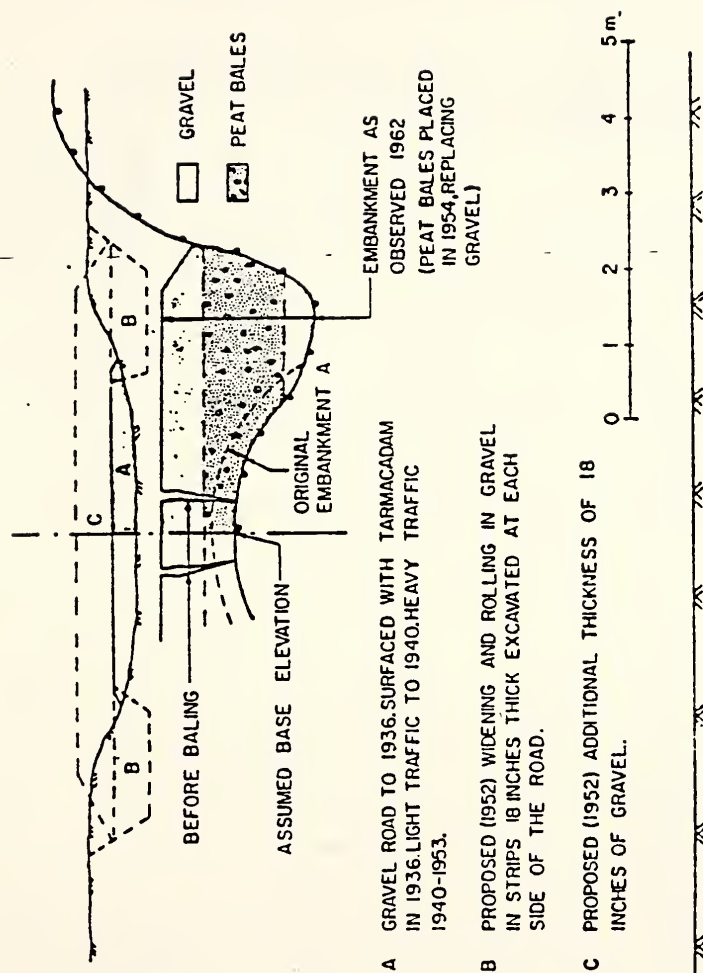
Section Through Road on Peat. From Landva (1980).
